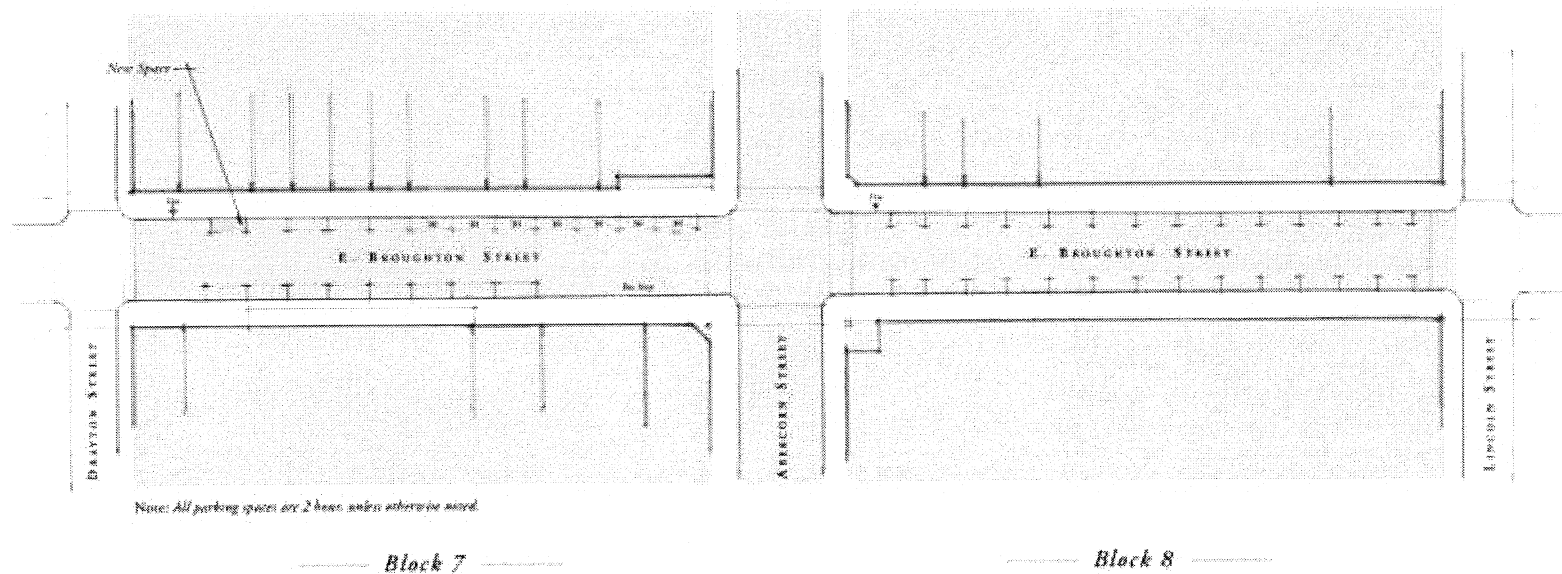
Broughton Street Potential Conditions (Blocks 7 and 8; Drayton Street to Lincoln Street)
